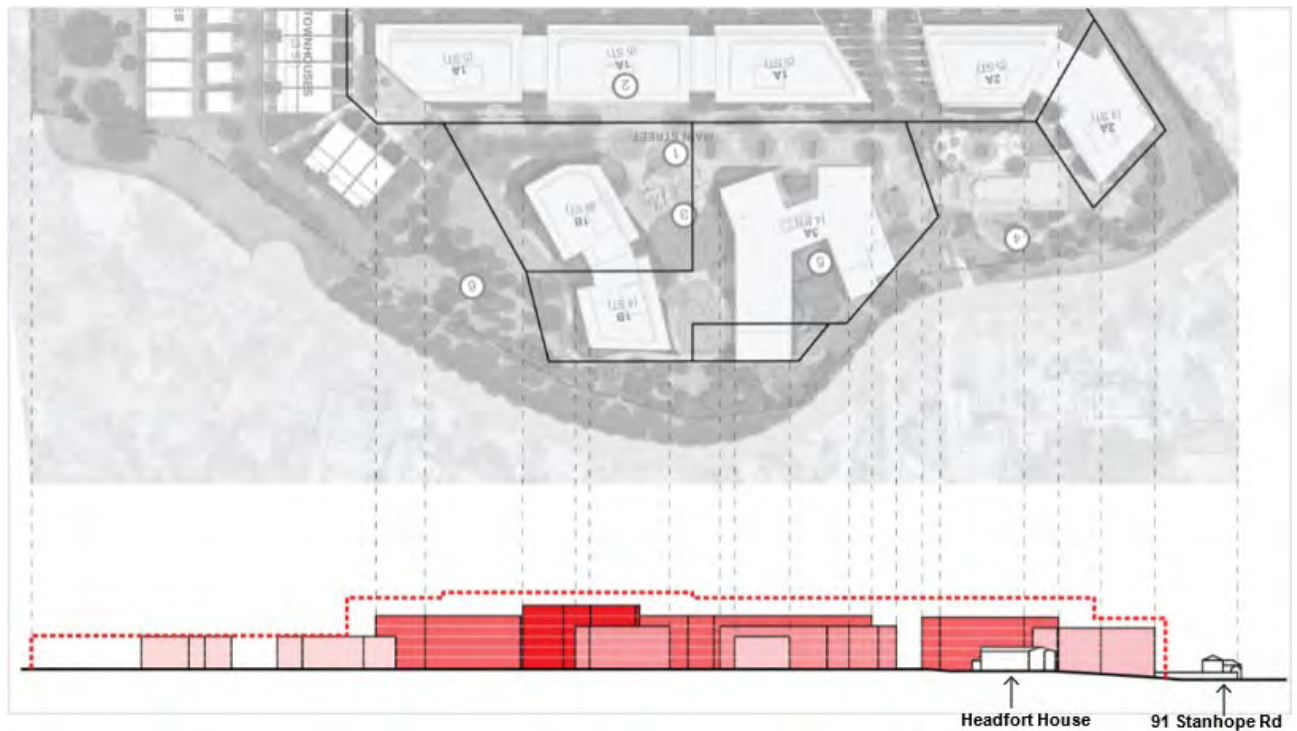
Built Form with Building Envelope - elevation to Stanhope Rd – excessive bulk and scale presentation to Stanhope Rd, to Headfort House setting and to 91 Stanhope St.
